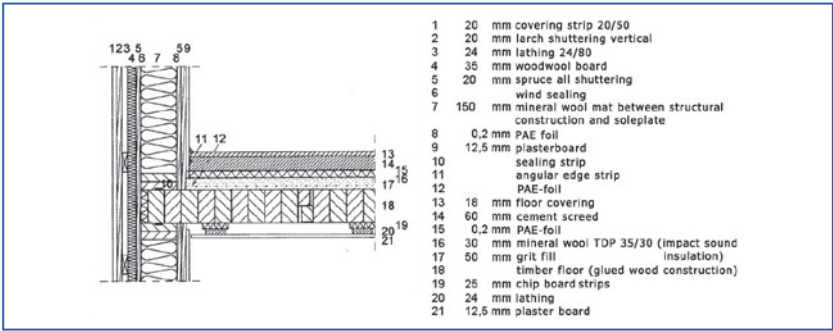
Connection between outer wall and floor (vertical section) [[2] - (Austria)].
